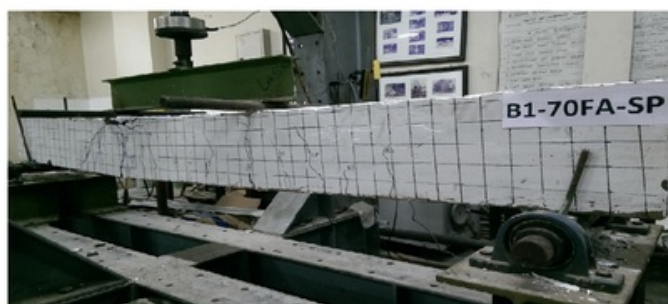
The crack pattern of B1-70FA-SP specimen.
